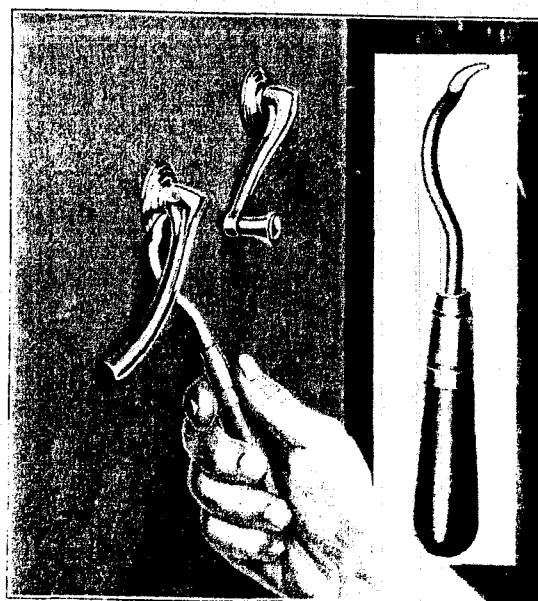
Special tool No. HMB-127 is necessary for removing all inside handles in closed cars
